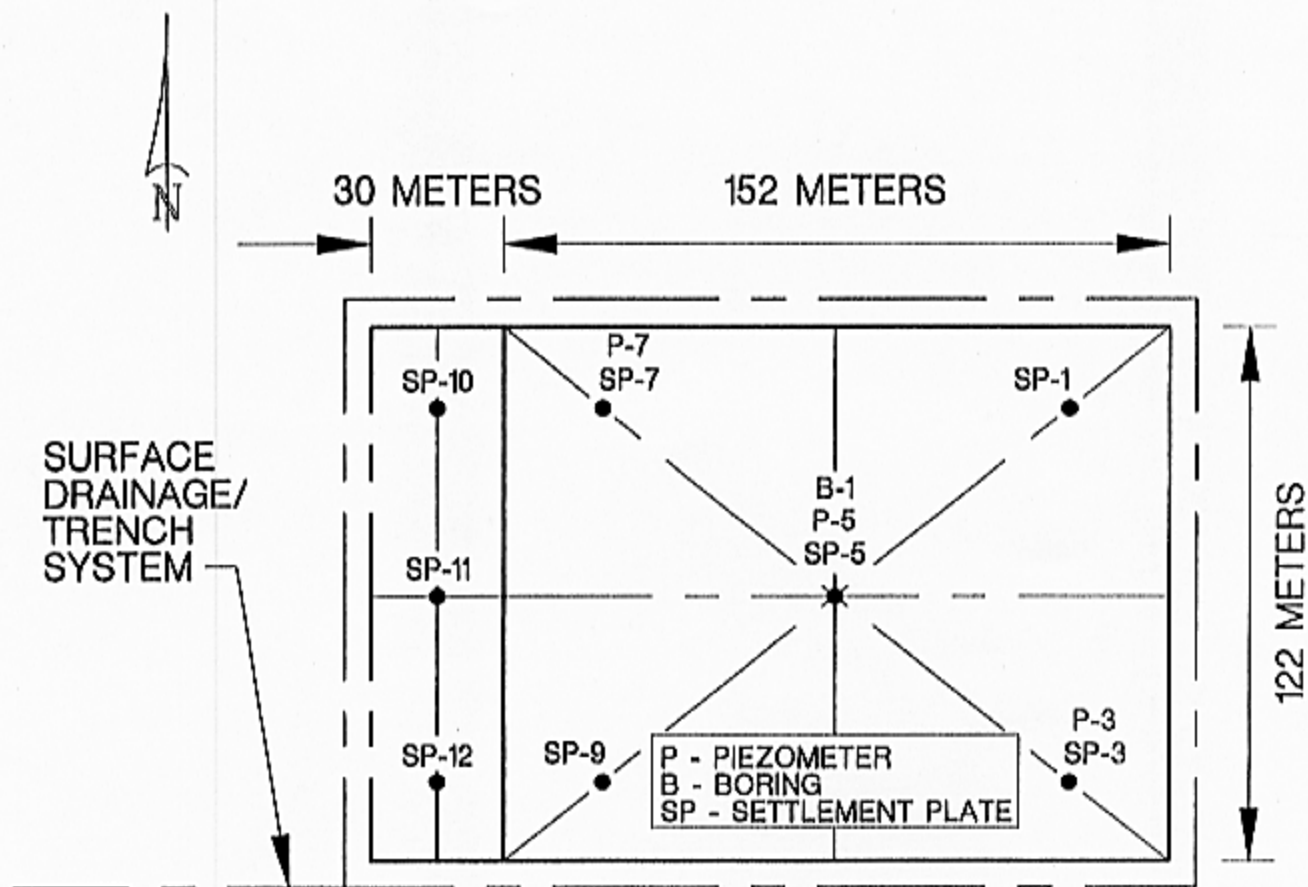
Location of Settlement Plates, Piezometers, and Boring in Test Section
